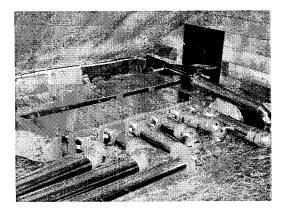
,001.jpg</u>, shows installation of "tru-vents" between rafters of attic space during renovation to conditioned mechanical room.
